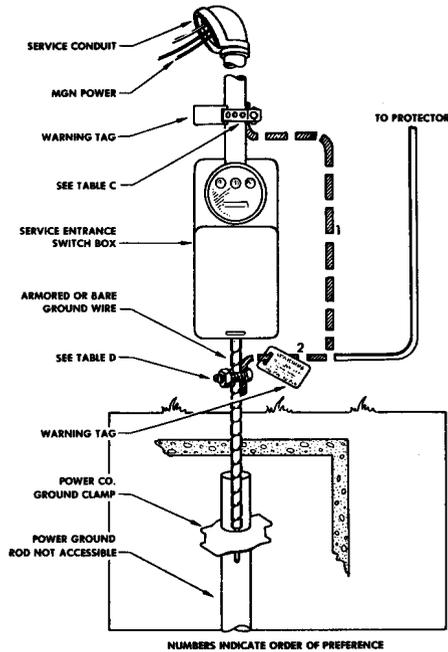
MGN Power Grounded to Inaccessible Ground Rod—No Water Pipe—Connection to Pipe Not Possible
